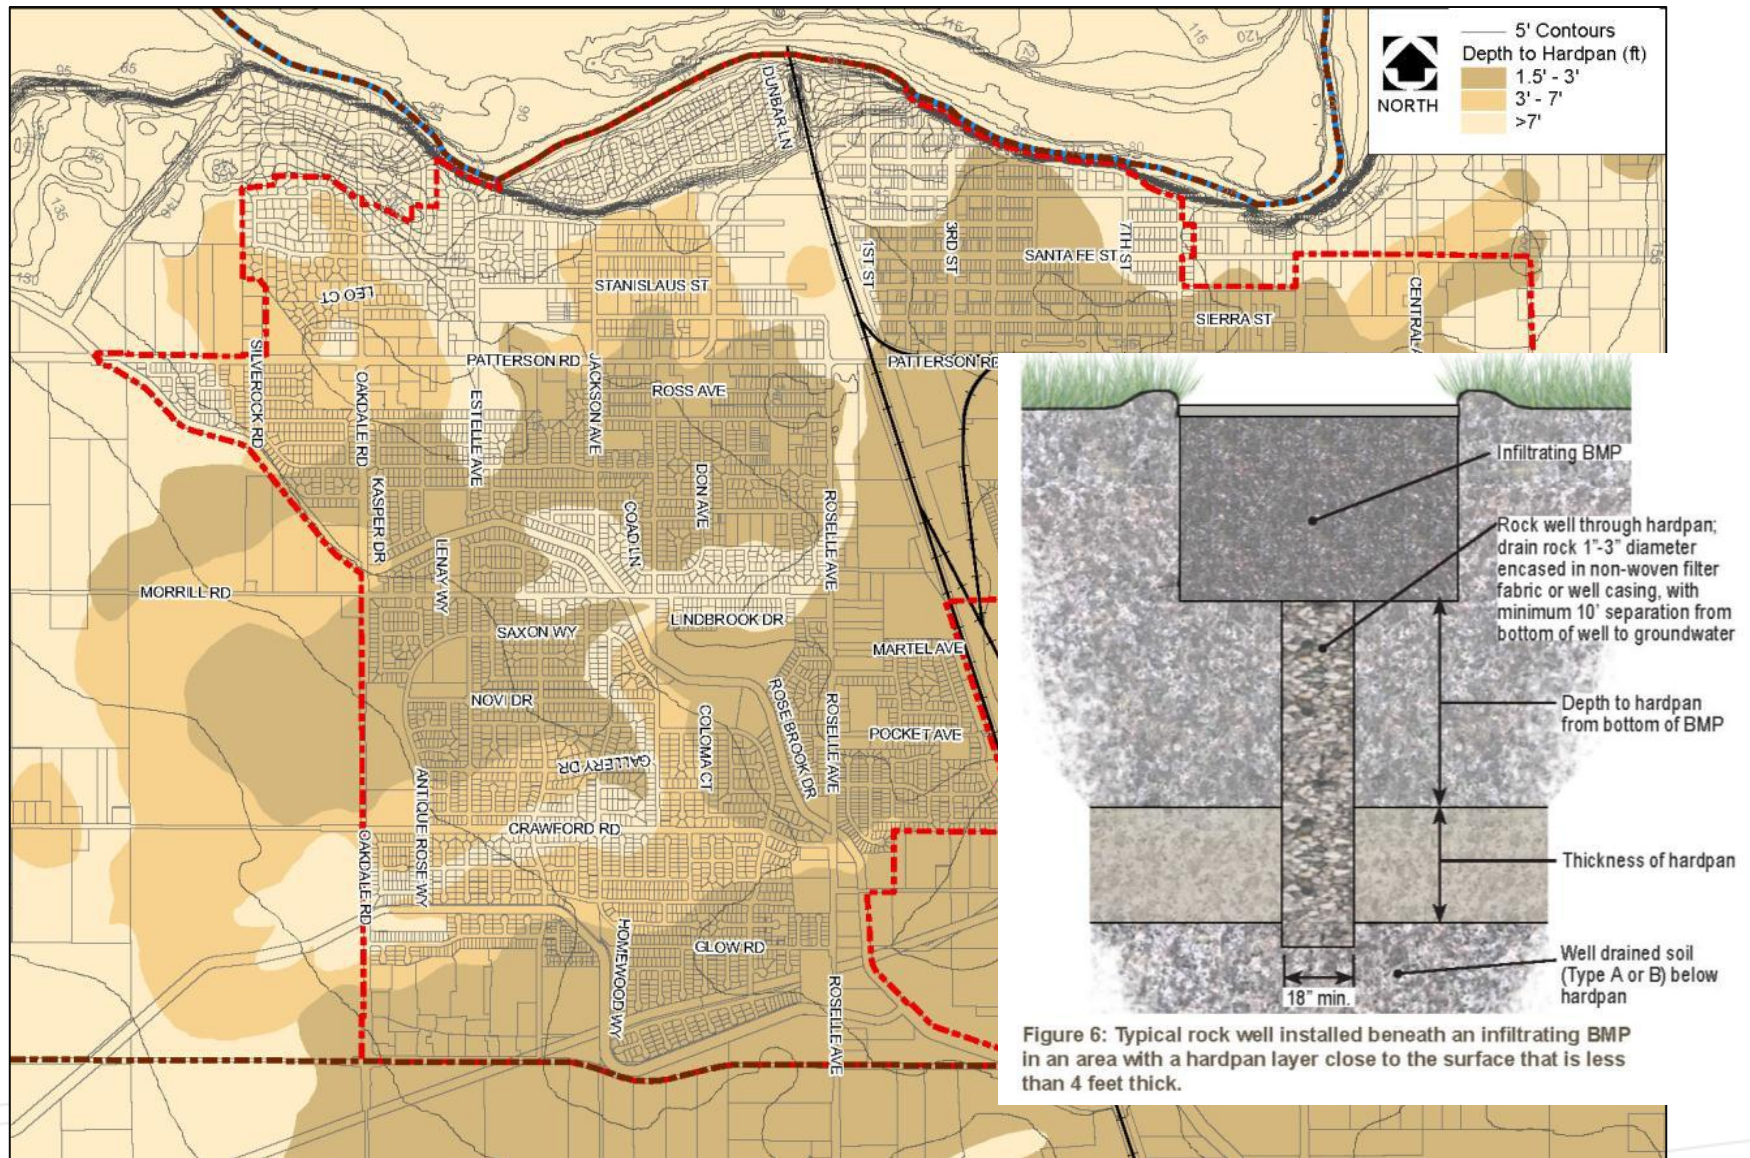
Typical rock well installed beneath an infiltrating BMP in an area with a hardpan layer close to the surface that is less than 4 feet thick.
